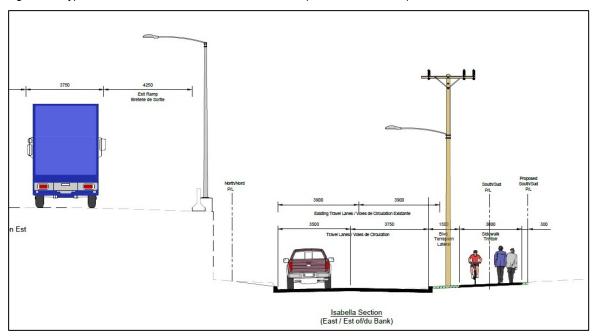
Typical Cross-section – Isabella Street Renewal (East of Bank Street)
